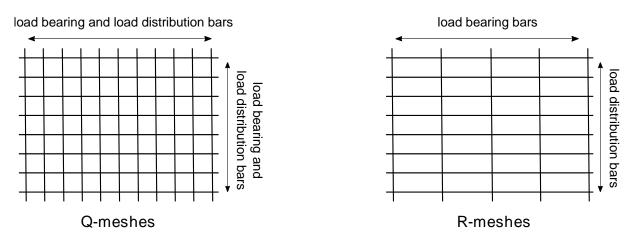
Sketch of Q- and R-meshes with steel bars as reinforcement for shotcrete
